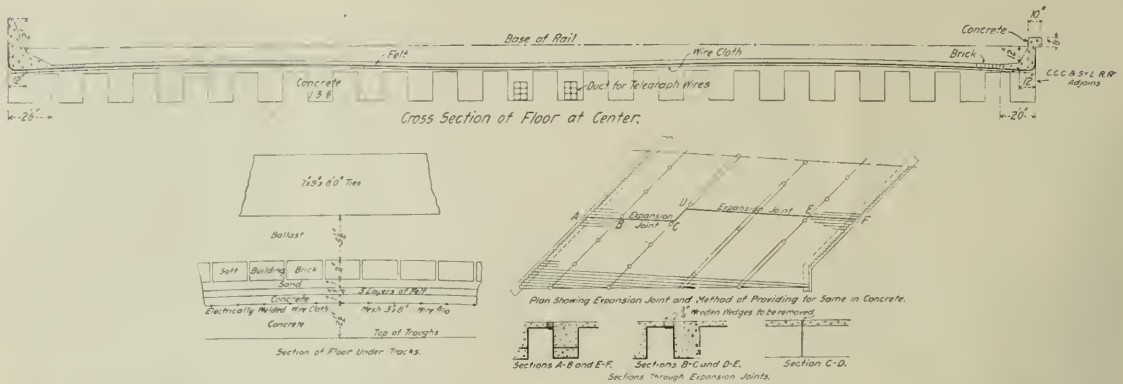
Details of Concrete Floor; Kentucky Avenue Bridge.
